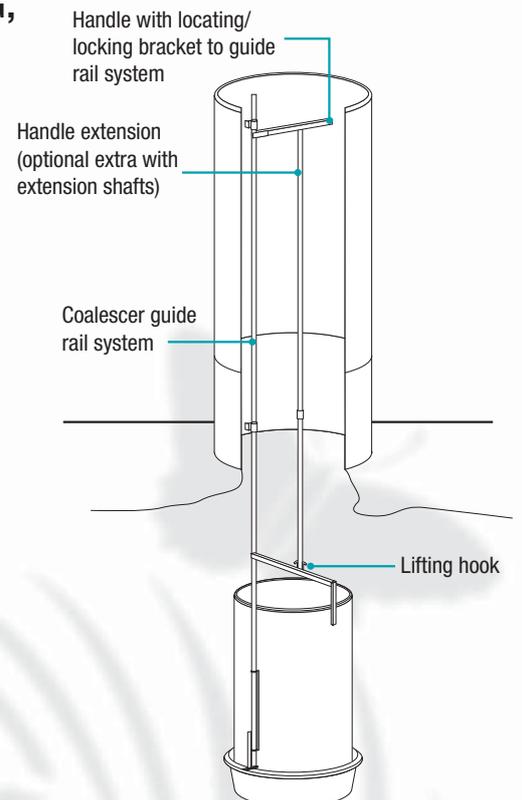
SPEL coalescer unit guide rail system/lifting, locating and locking system
